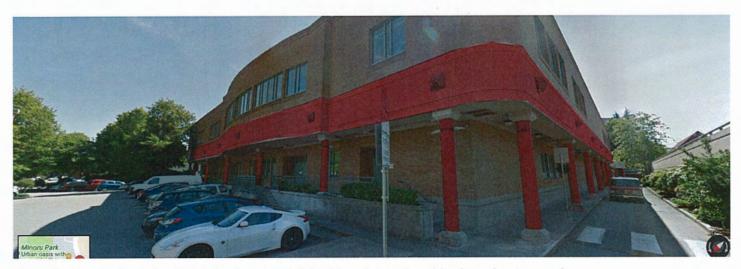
Exterior fascia banding and columns, highlighted in red at north parking lot and east access lane.
